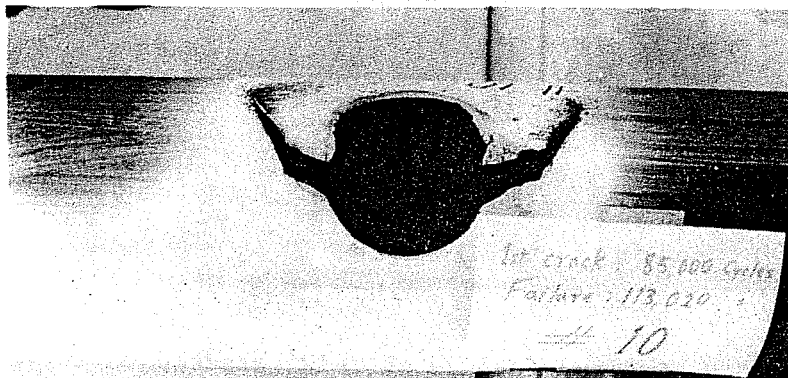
Fatigue failure of T-10 (cracked on one side)
